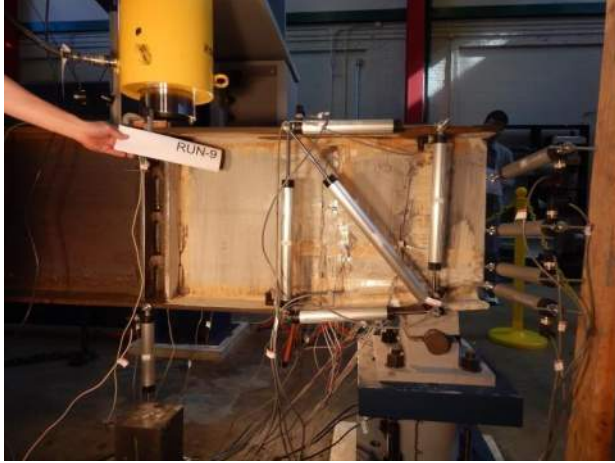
Damaged Girder Left: +0.75 in
